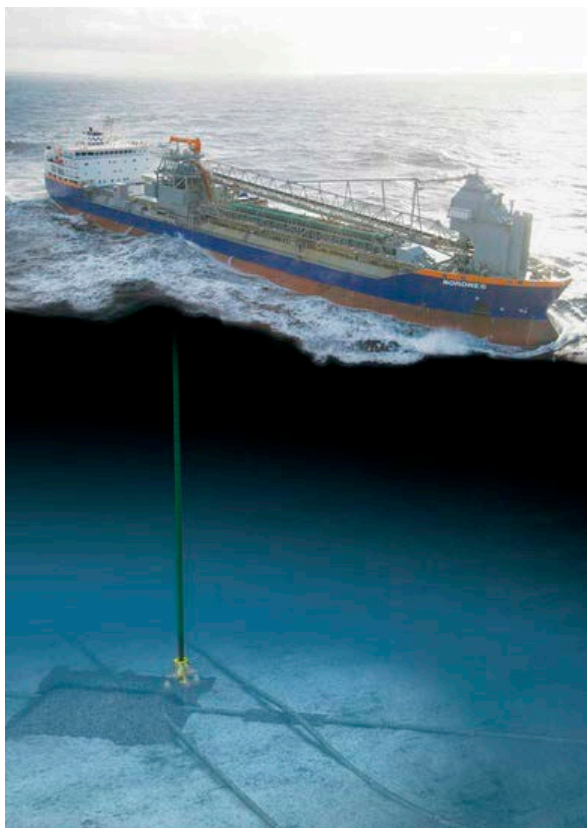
Subsea rock installation - accurate positioning by fall pipe (Ramboll 2013).
